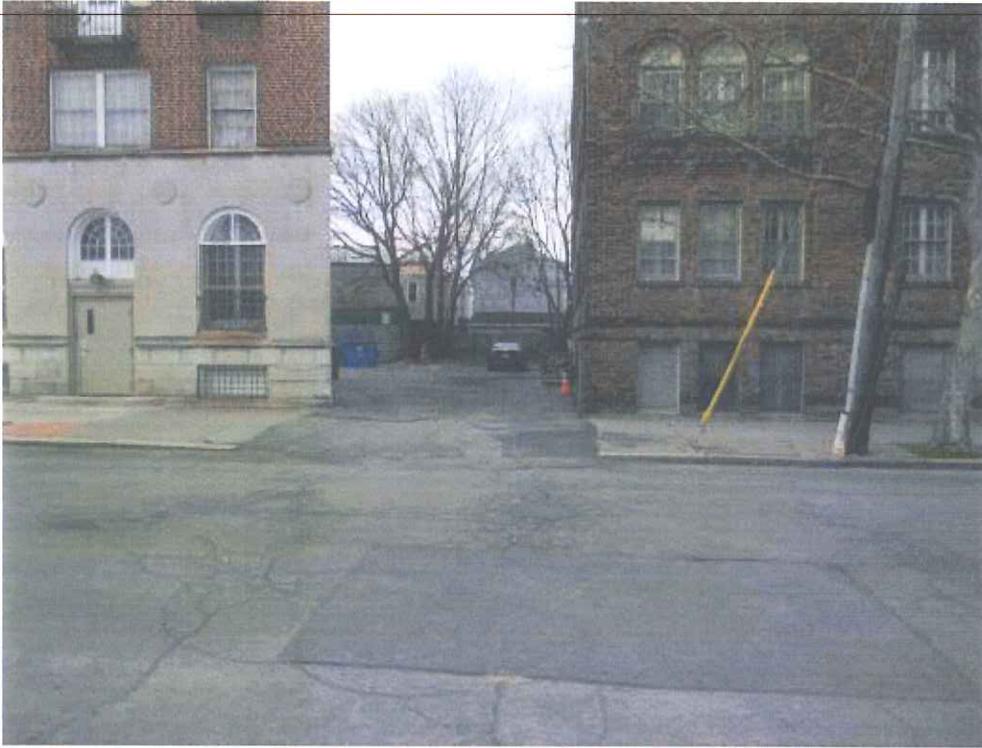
Looking at the proposed shelter location from Stanwix Street.
